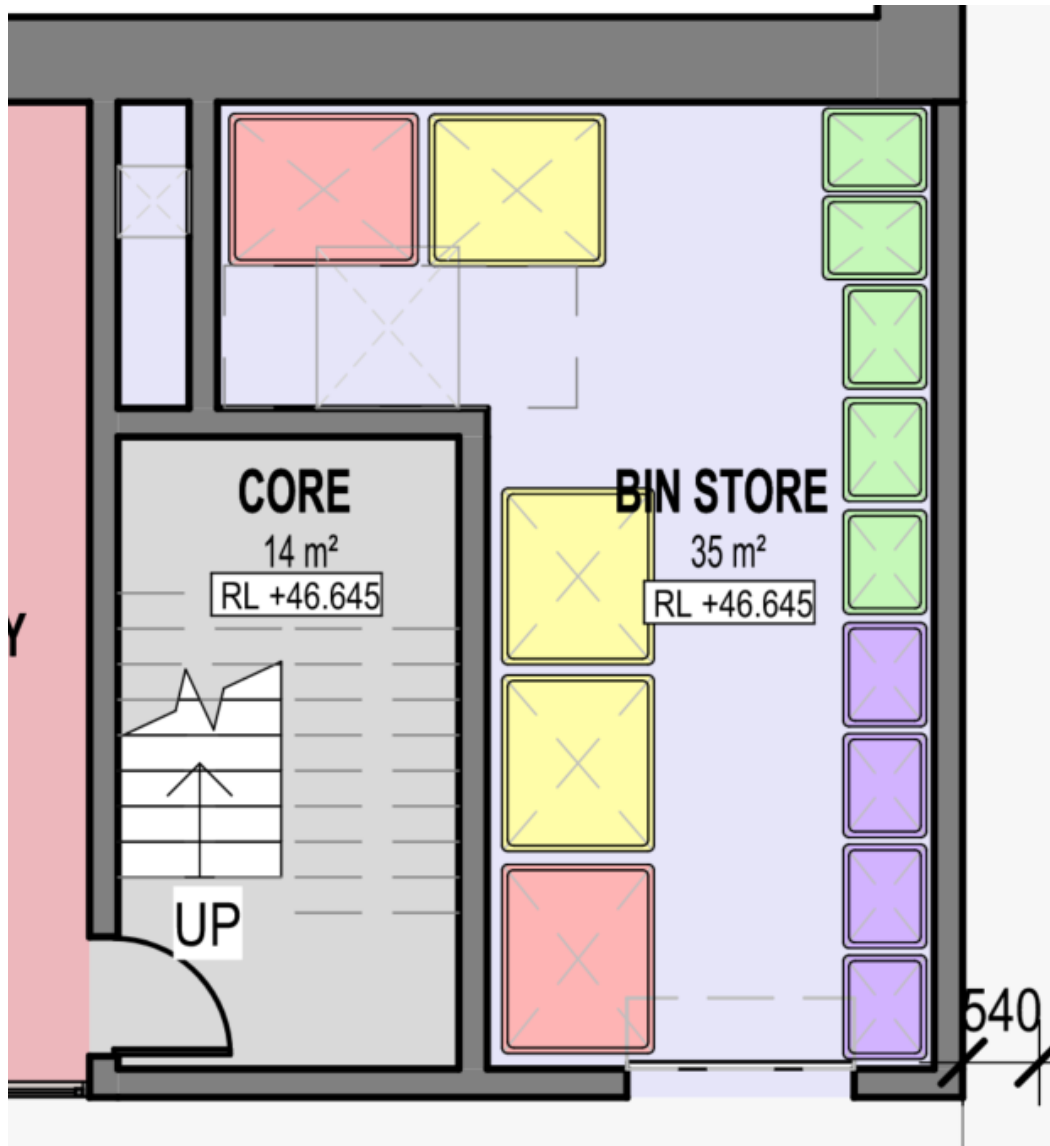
Bin Room Layout - Building C (Apartments - Southern)
